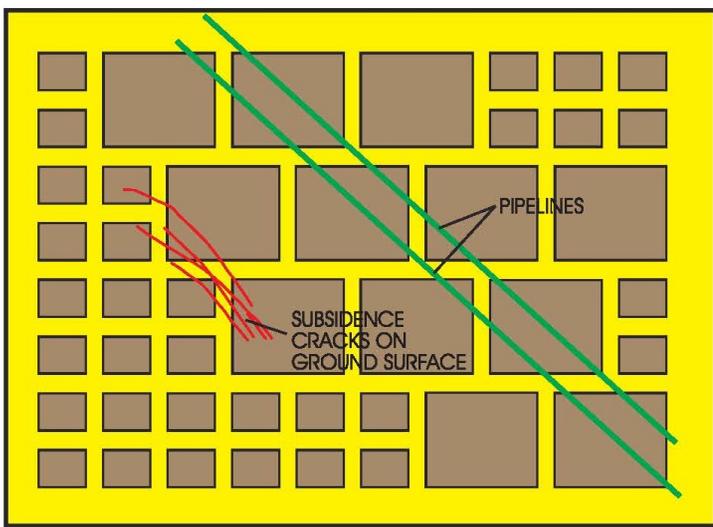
MINE SUBSIDENCE WITH SURFACE CRACKING TO LIMIT PILLAR SUPPORT FOR PIPELINES
